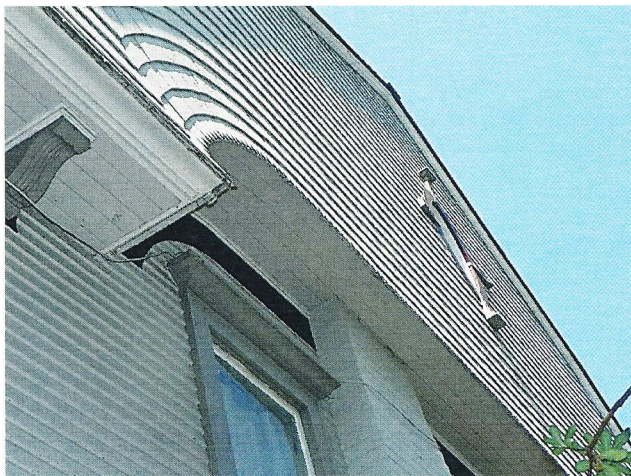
2770; View: E side-elevation gamrel face; Photo Date: August 2021; Camera Facing: NW
